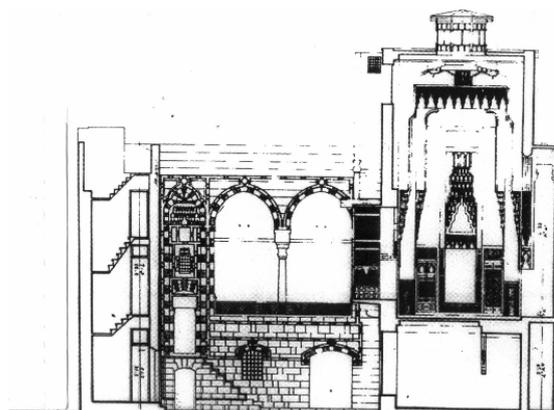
House of Zainab Khatoun Façade (1468 AD)
